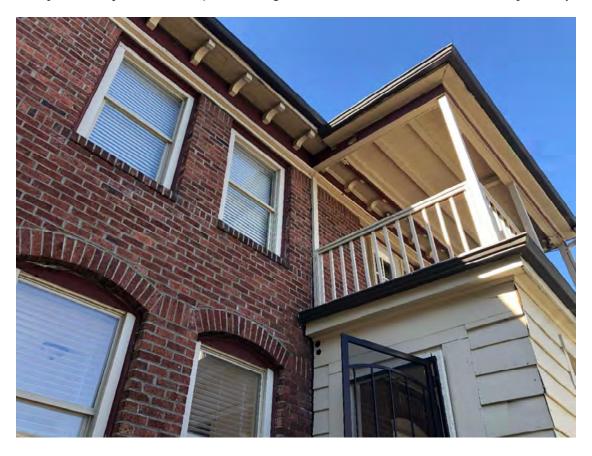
(After). Newton Apartments, porch at east façade, looking NW. August 2020. Source: Stephen Day Architecture.
